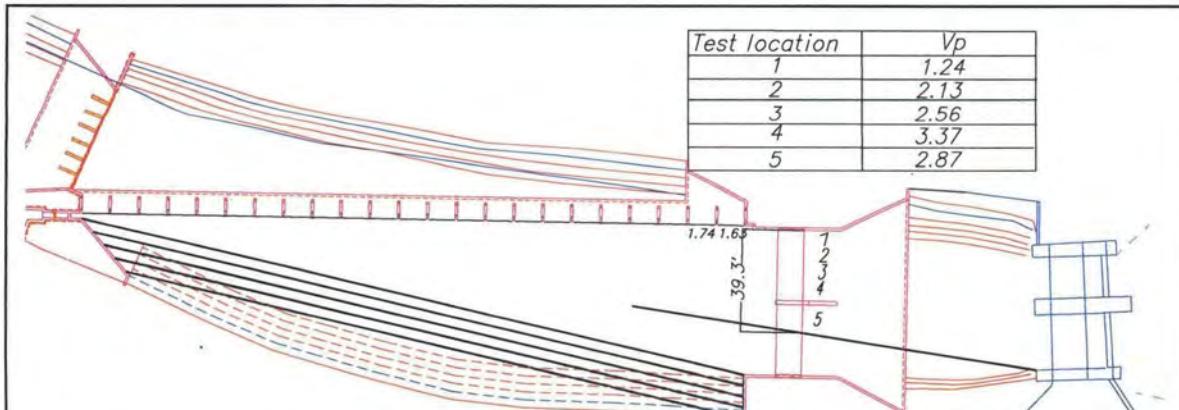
Single wall on the left side of the canal to reduce the total width of the canal section at the trashrack bridge. (single us wall.wmf)
